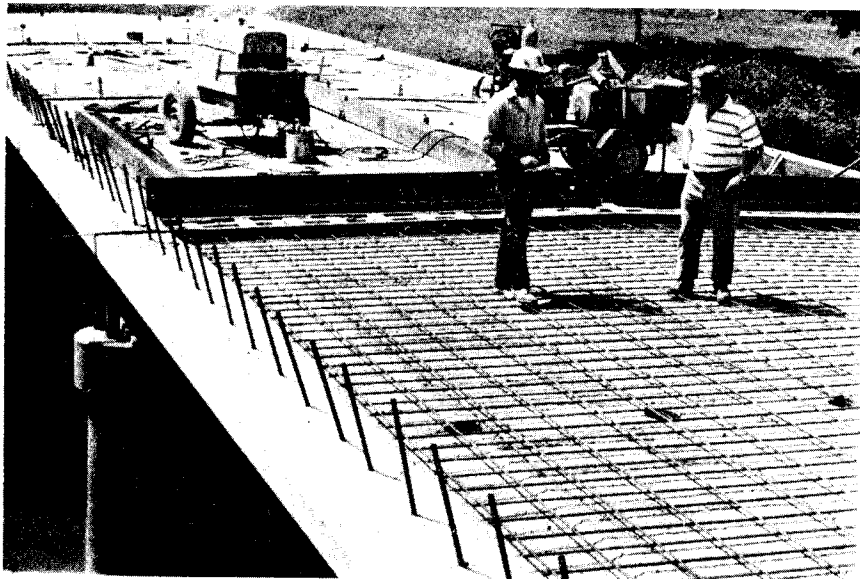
Dickenson County bridge prior to placement of 4-inch (10 cm) concrete overlay on the first of four spans.
